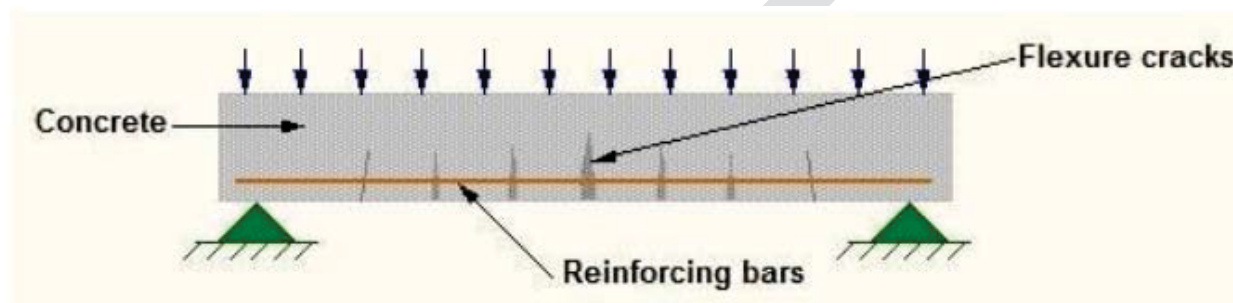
Flexure Cracks of a Reinforced Concrete Beam or Wall Element with Supports at Both Ends under Uniformly Distributed Loading
